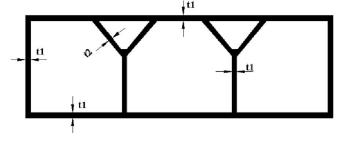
Cross section of GFRP bridge deck panel in terms of parameters
